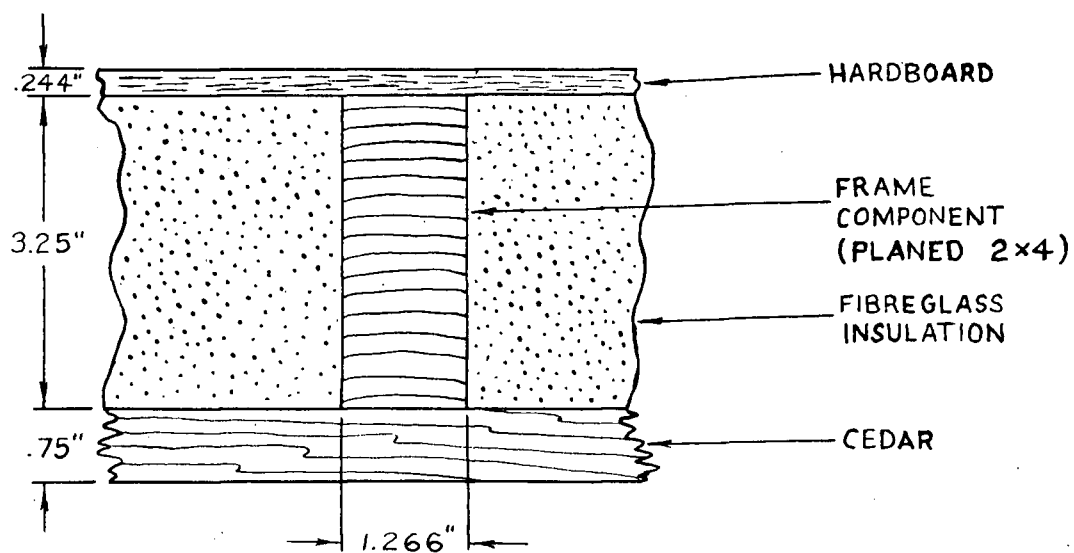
CROSS SECTION AT A FRAME COMPONENT
